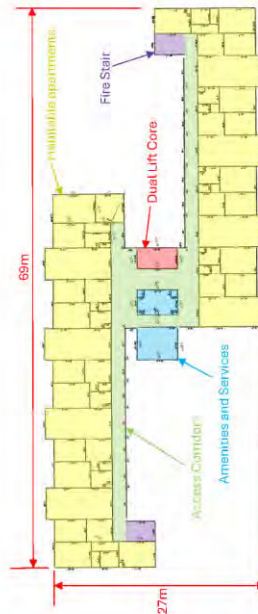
Plan view, typical floor, of the S-Type Housing Commission Building.
